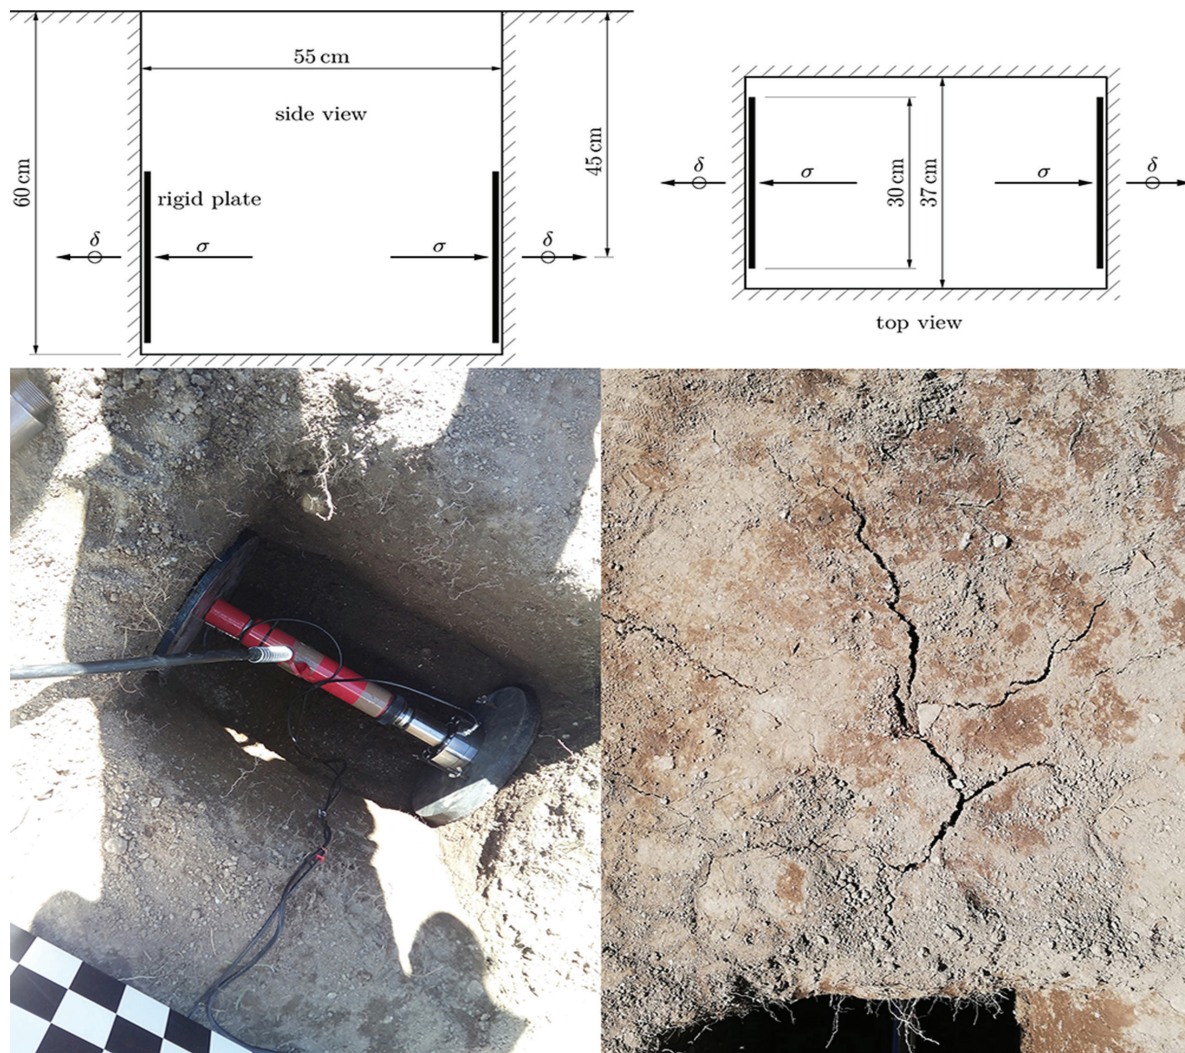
Horizontal load plate test geometry, assembly, and induced cracks.
